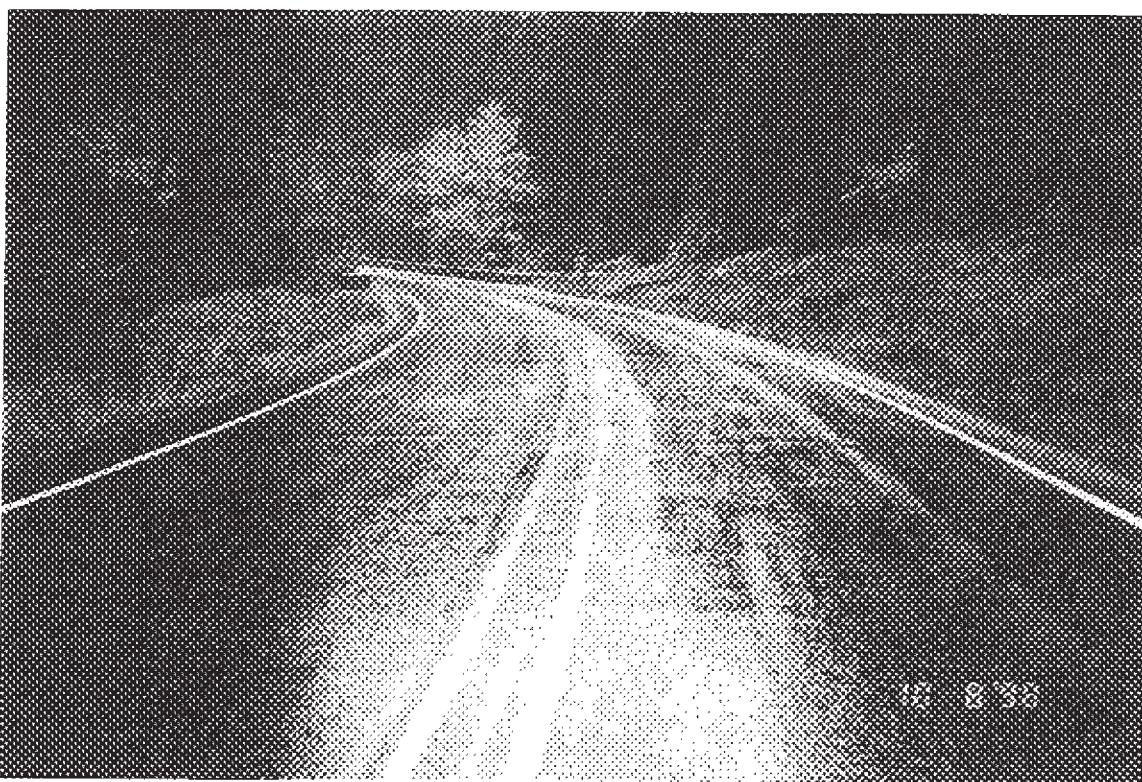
MP 2.40 - Typical pavement section and bridge
